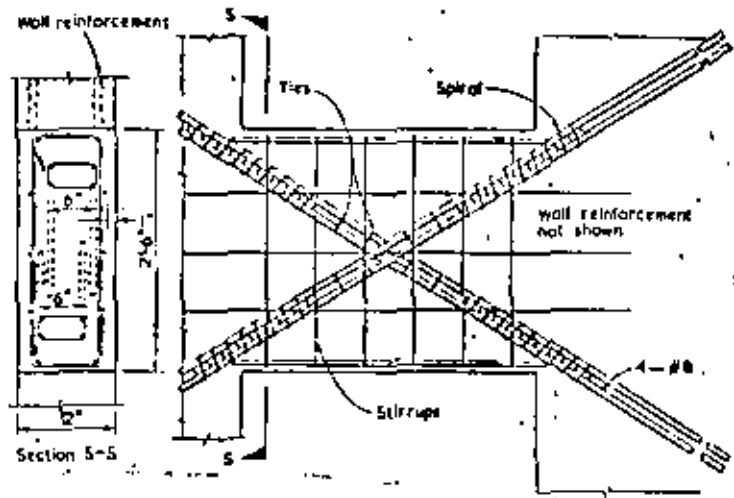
Suggested reinforcement for coupling beam (after Paulay²²)
